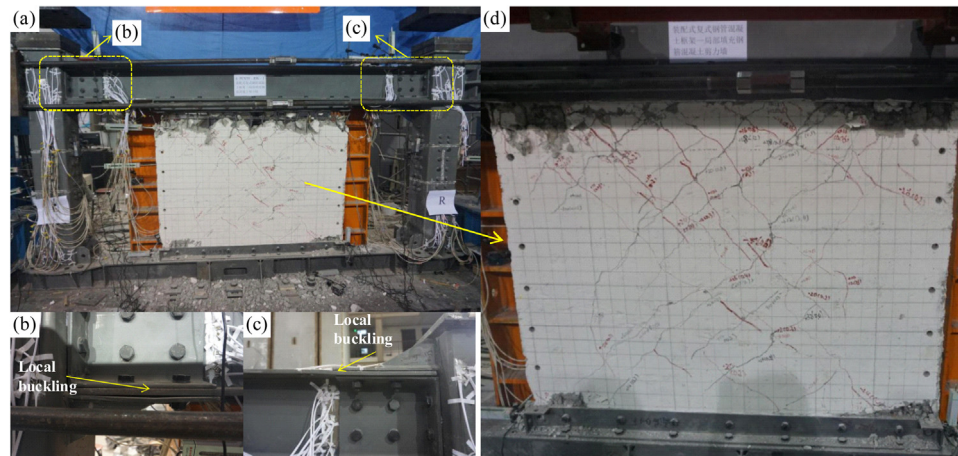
Failure patterns of the specimen BF (a. final failure mode; b. failure of the left beam-to-column joint; c. failure of the left CFDST column; c. failure of the right beam-to-column joint; c. failure of the right CFDST column).
